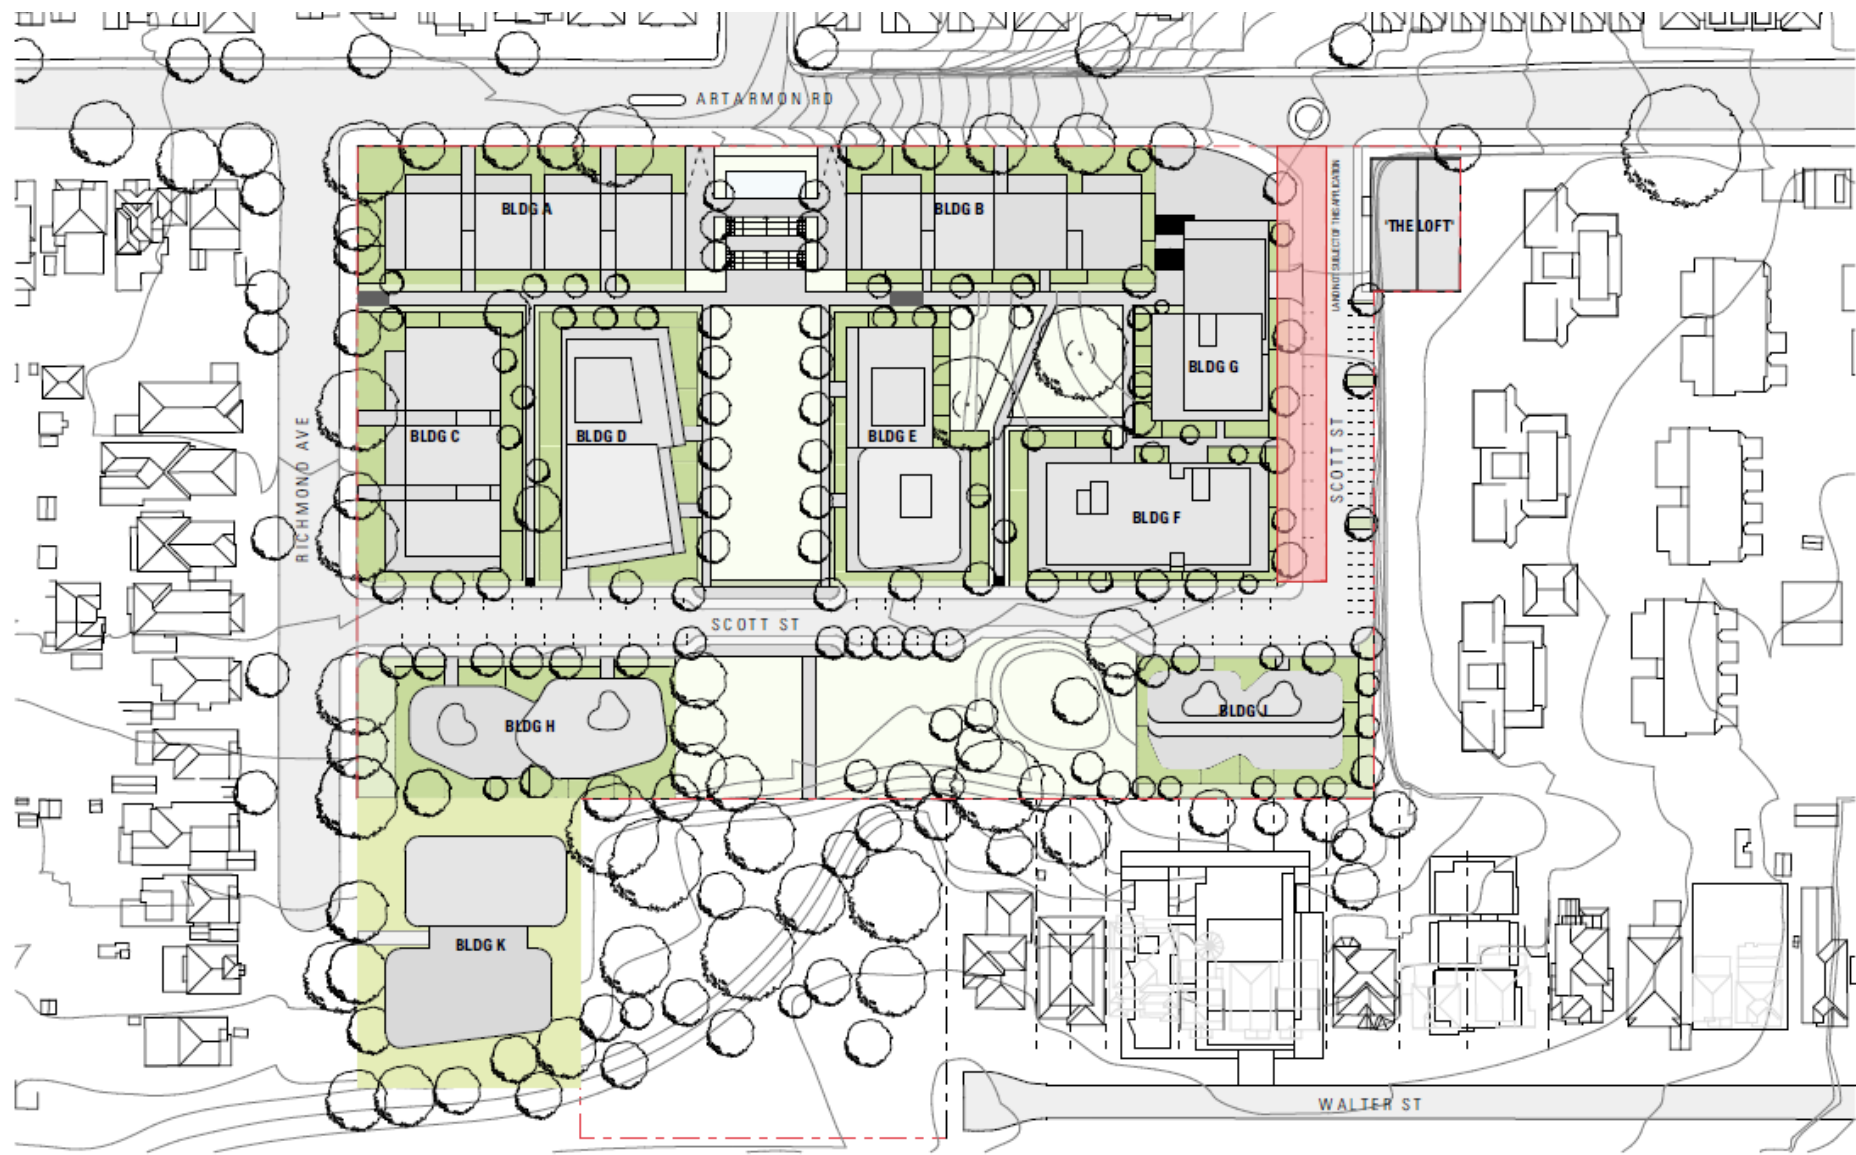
Proposed Concept Plan with addition of TXA Site (Building K)
